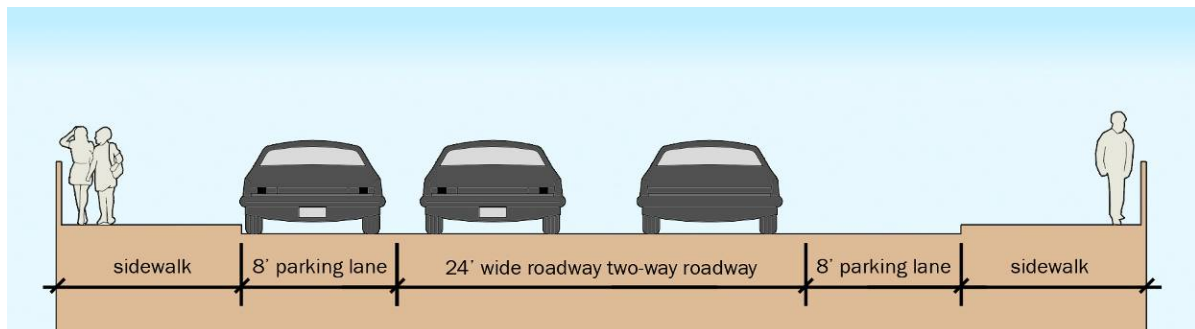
Court Street Typical Section (Exchange Boulevard to South Ave)
